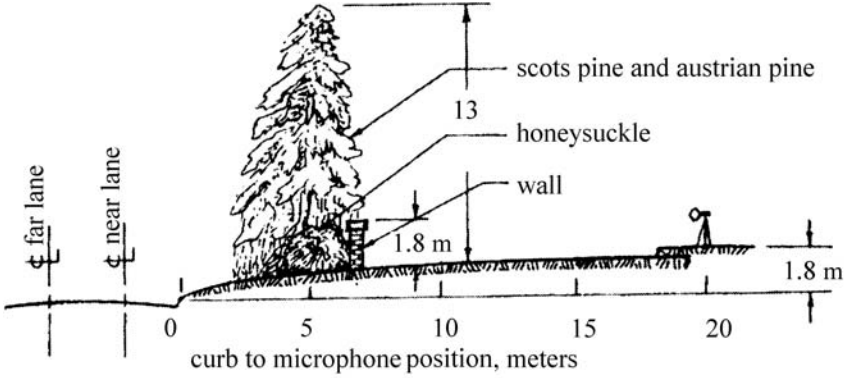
Site C has a tall evergreen hedge, brick wall and an upward sloping ground profile from the street to the residence (Cook and van Haverbeke 1972)
